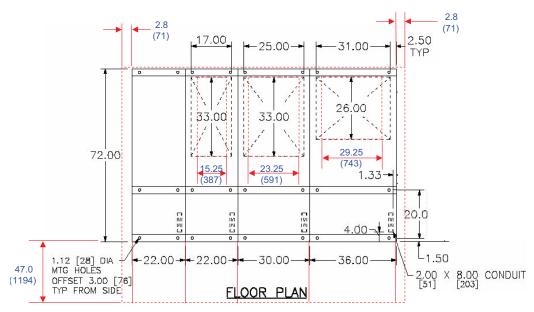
NEMA 3R Walk-in Low Voltage Switchboard/Switchgear Bottom Conduit Entrance Dimensions-Not for Construction (consult factory drawings)
